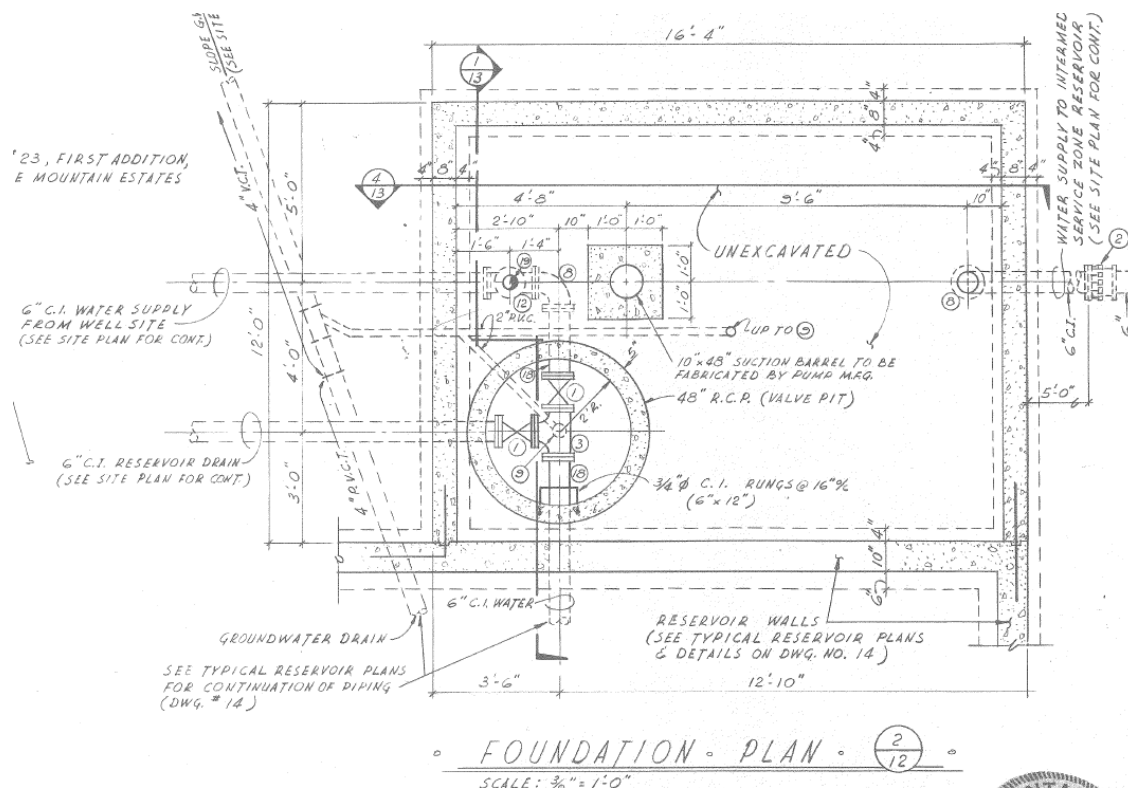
Original Mid-Station Foundation and Subfloor Piping Plan
